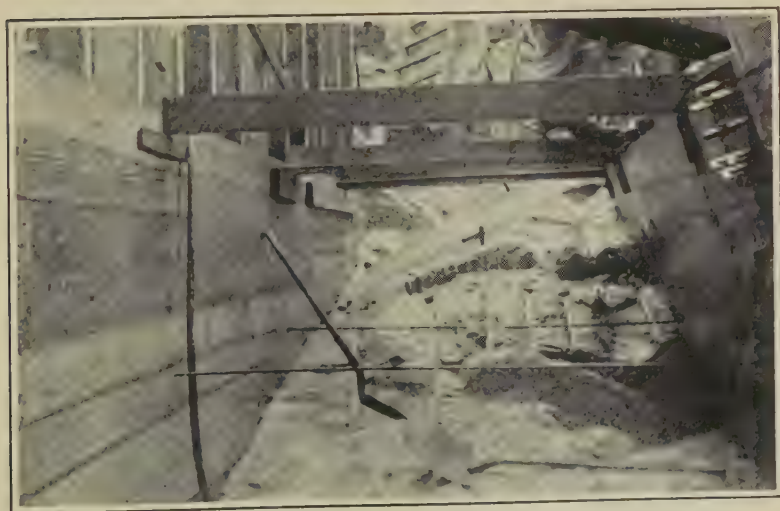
FOUNDATION AND INTERIOR OF FORMS BEFORE CONCRETING.
